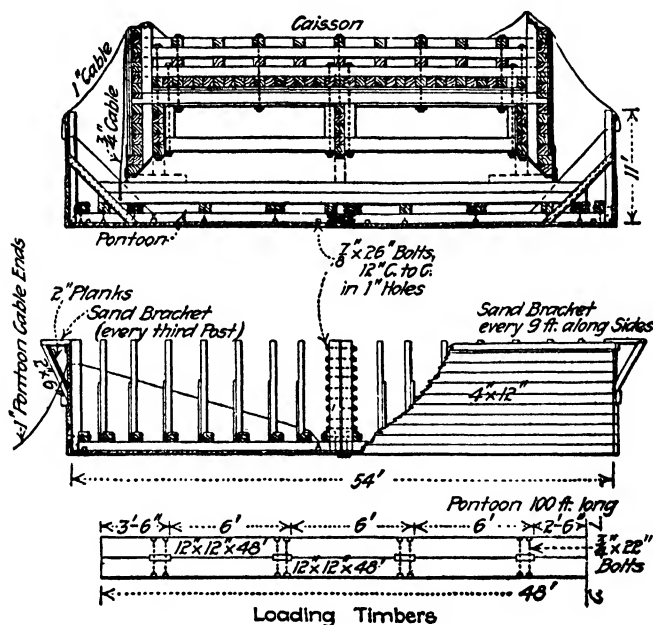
Caisson-launching Pontoon, New Memphis Bridge.
